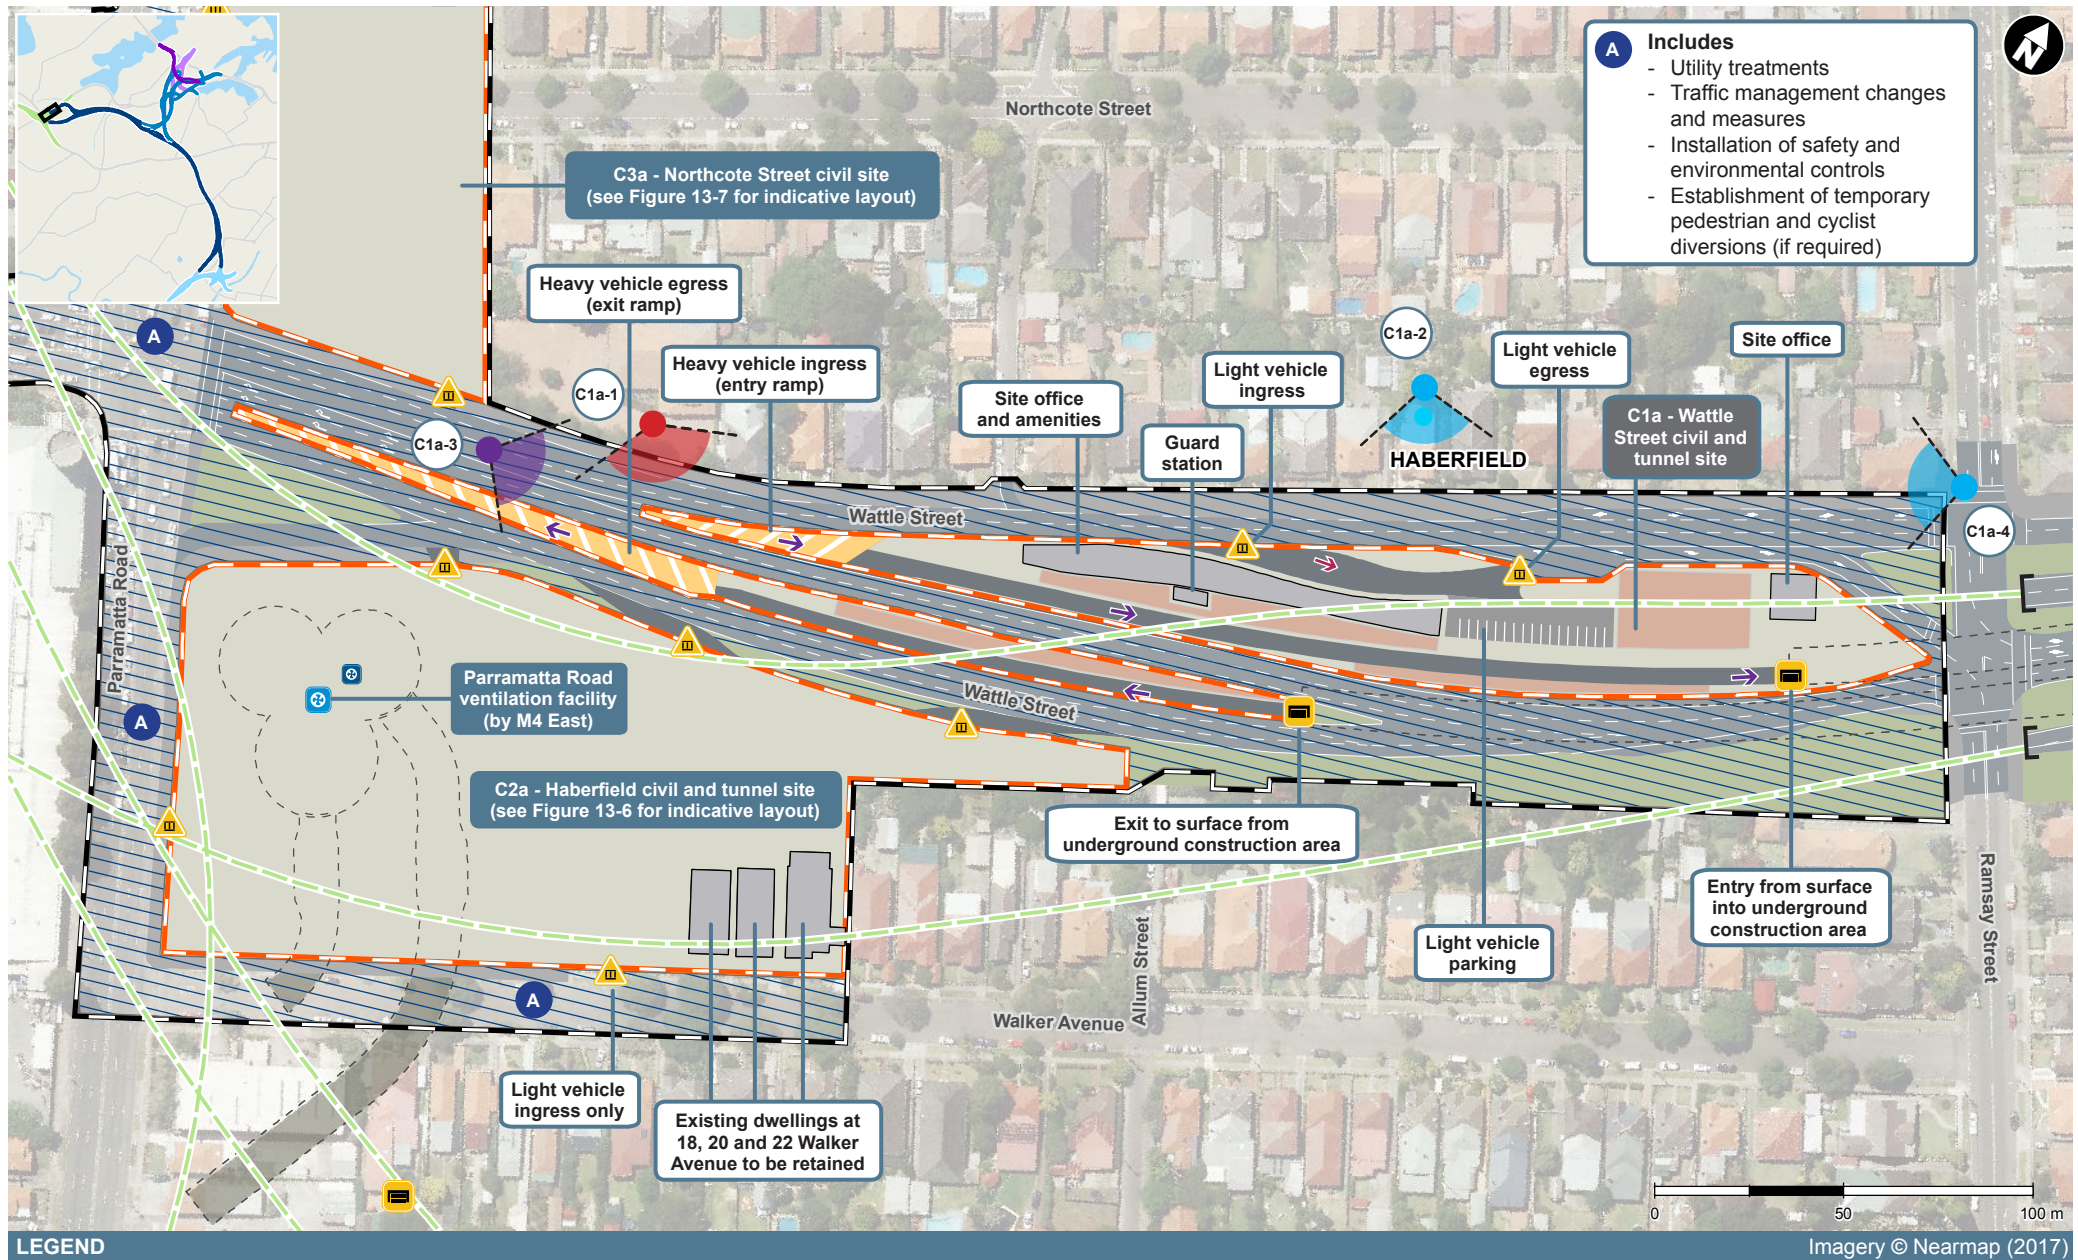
Wattle Street civil and tunnel site (C1a) representative receiver locations
